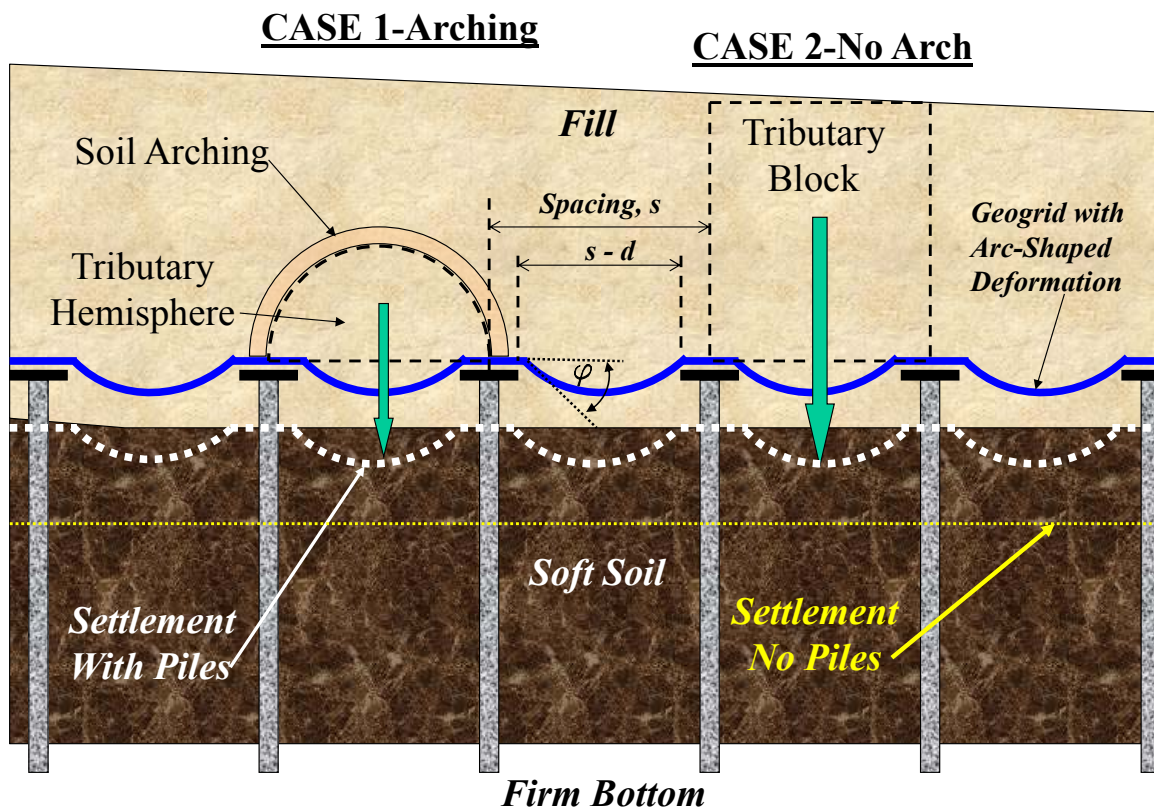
Key components of a pile supported embankment having a geogrid/geotextile reinforced load transfer platform.
